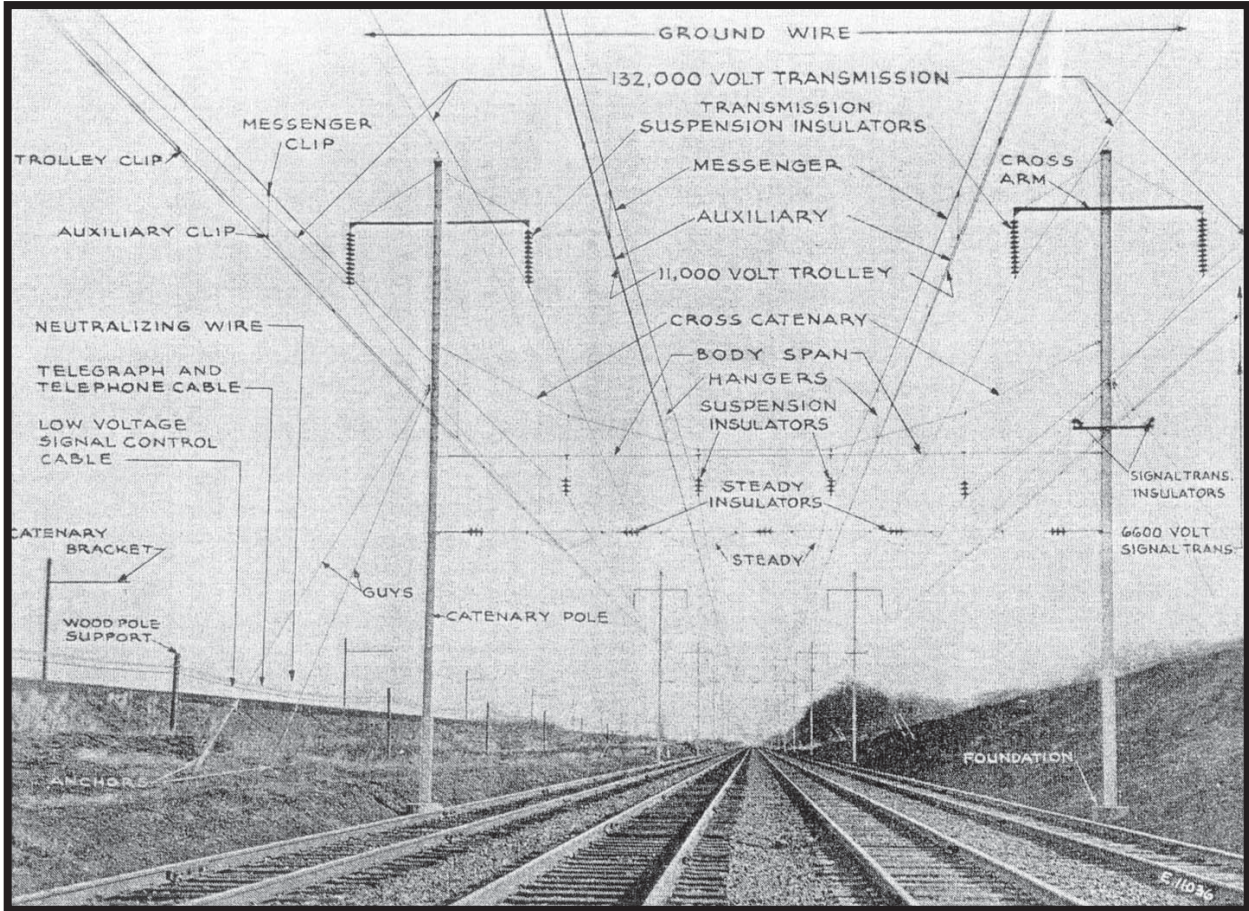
Typical Catenary Structure Used on the New York to Philadelphia Line in the 1930s (Source: Nesladek 1996).
